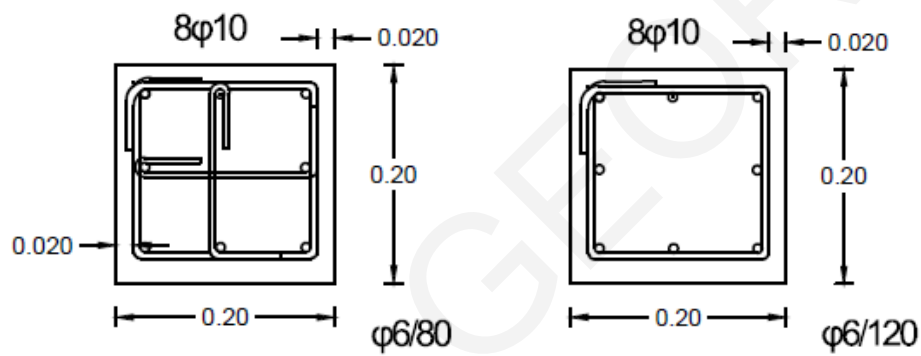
Stirrup detailing for (a) Member A: Control and (b) Member B: SHFRCC
